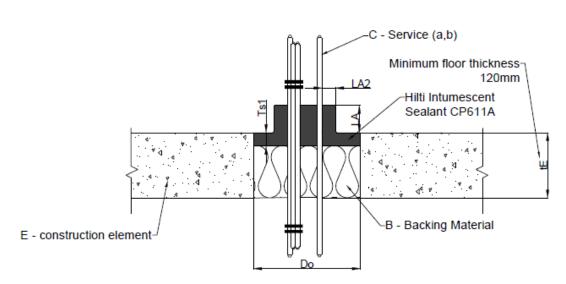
Side view, seal type 16, small cables ≤ 16mm and cable bundles ≤ 16mm, in concrete floor ≥ 120mm
